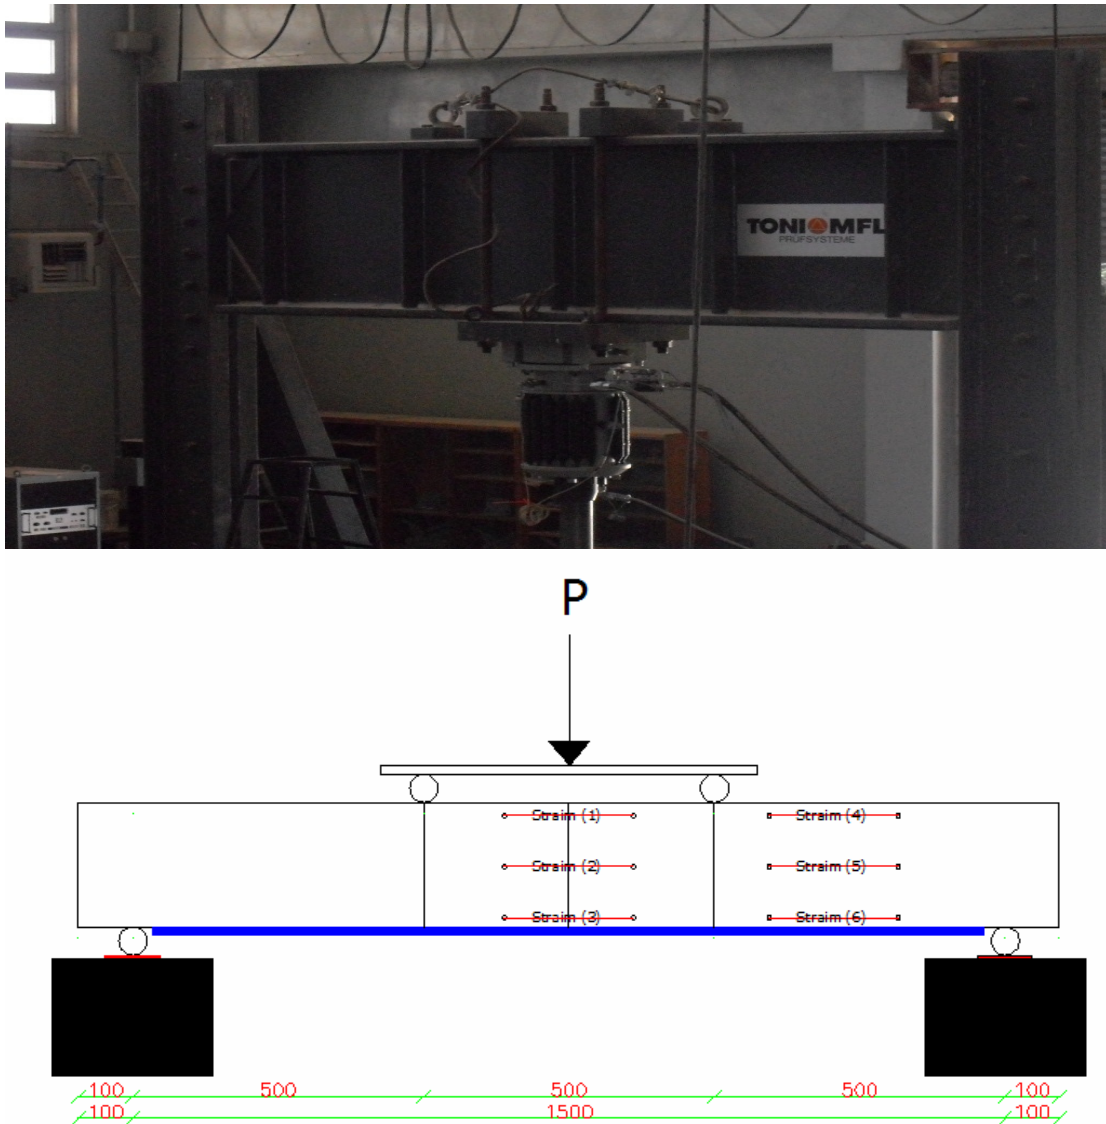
Test setup for rectangular beam specimens and position of displacement strain gauge transducers
